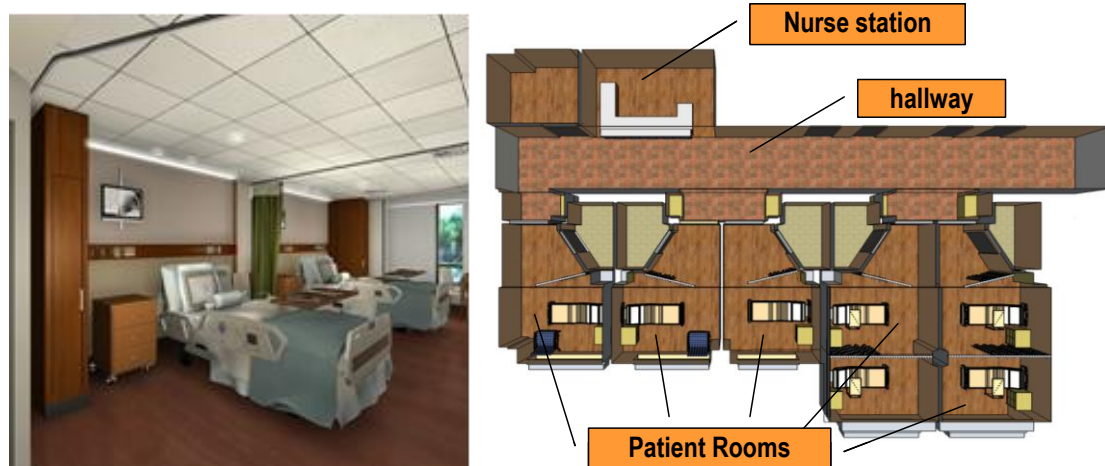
Space layout of the existing condition and the patient room layout prior to study.
